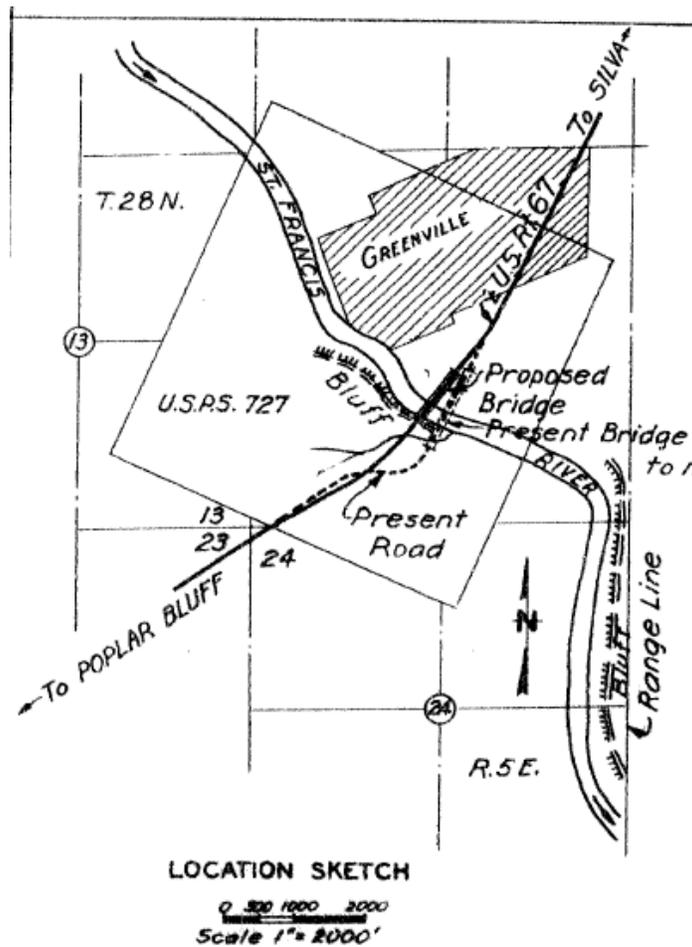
A location sketch illustrating the proposed location of bridge J21R and the existing bridge (J21) that it was to replace
